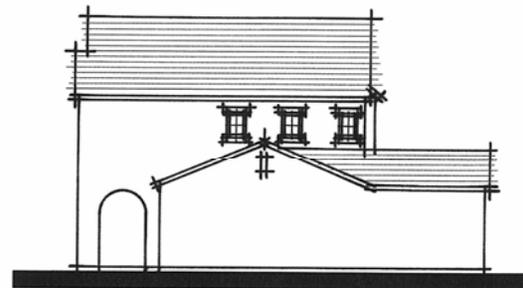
Plan 1 – Normandy Elevations
